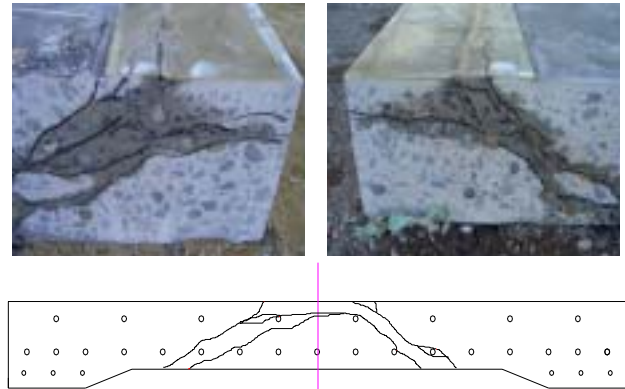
Punching shear damage in expansive concrete slab section
